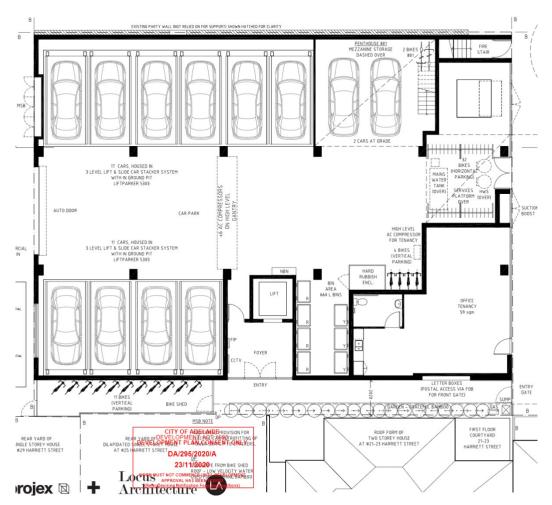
Approved Ground Floor Plan in DA/295/2020/A
